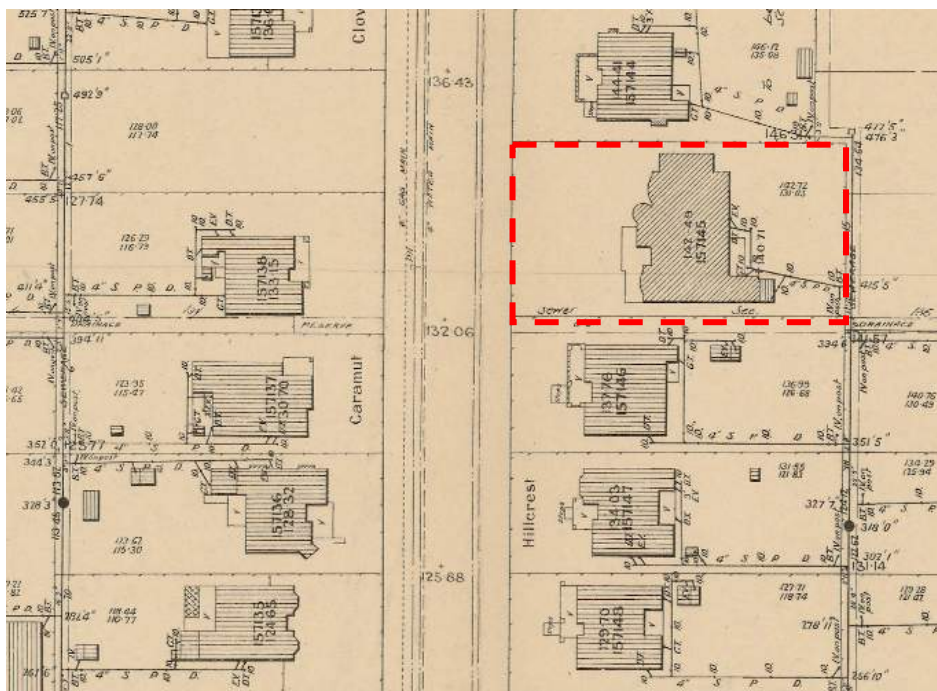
Detail of MMBW Detail Plan 2736, Municipality of Camberwell, 1927, illustrating the plan of the house soon after construction and the smaller size and timber construction of surrounding houses (Source: SLV).
